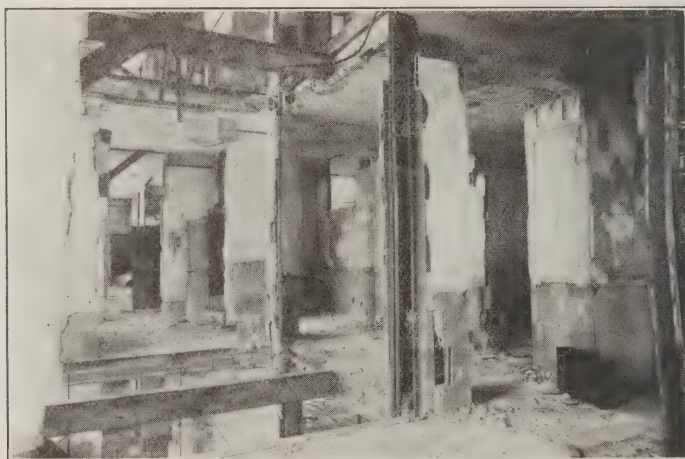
DAMAGE TO ELEVATOR FRAMING
